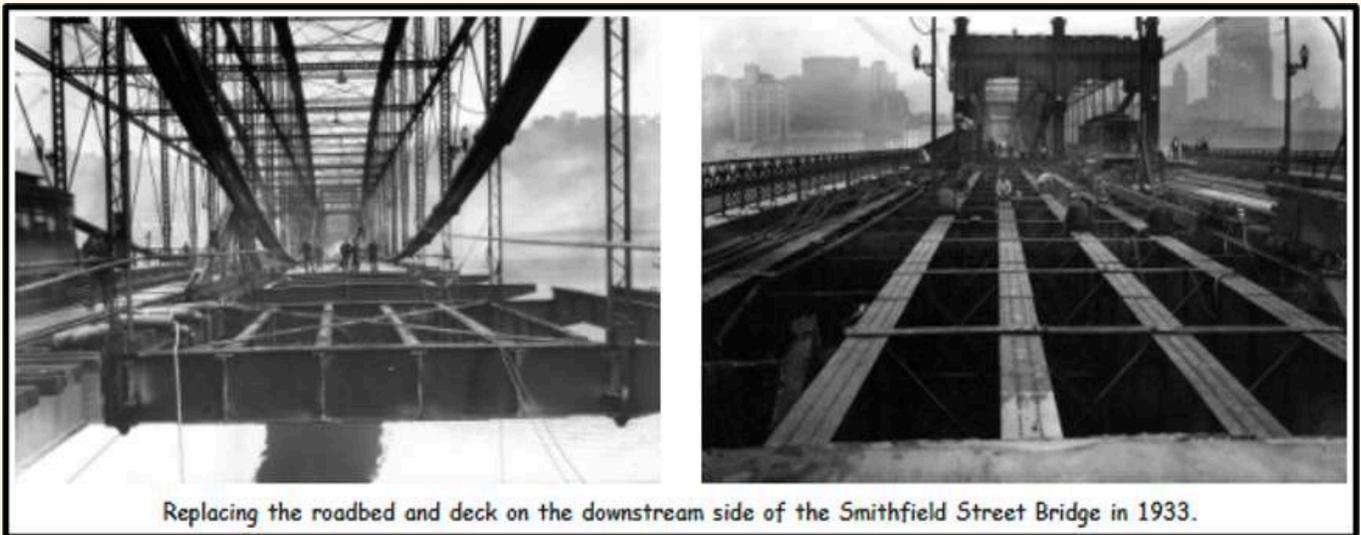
Smithfield Street Bridge renovation in 1933. Photo online from Brookline. Connection¹
